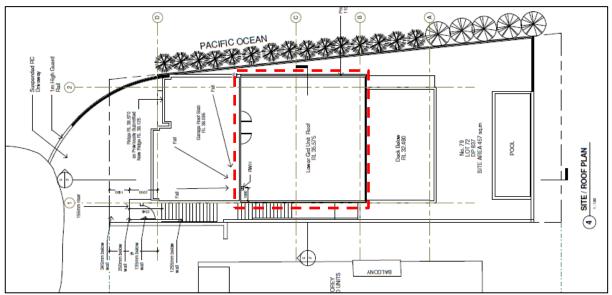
Excerpt of the refused ground floor level deck under DA-502/2015 outlined in red.
